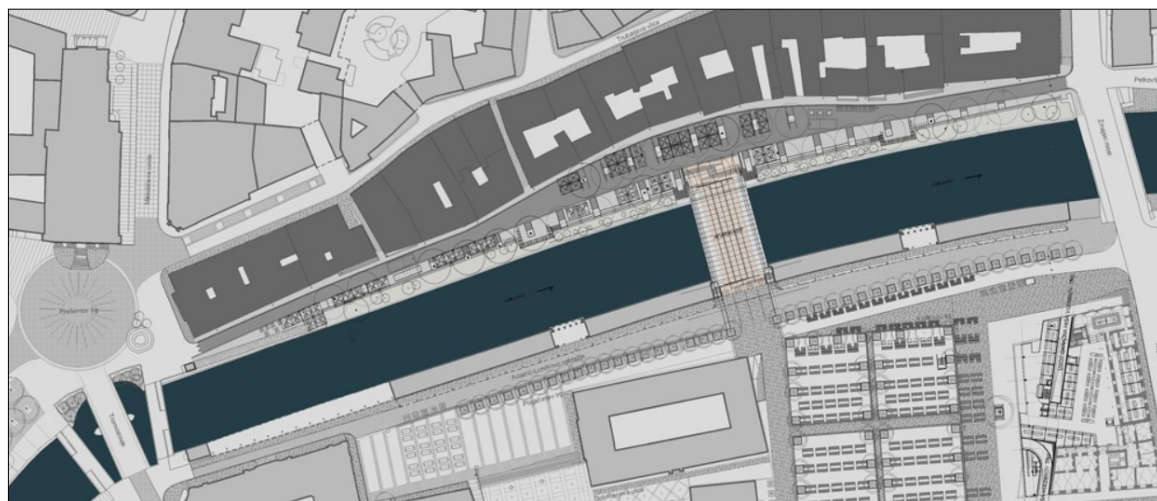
Illustration nr. 59 / Plan of the Intervention between Triple Bridge, on the left, and Grain bridge on the right. In the Centre is Butcher's bridge
